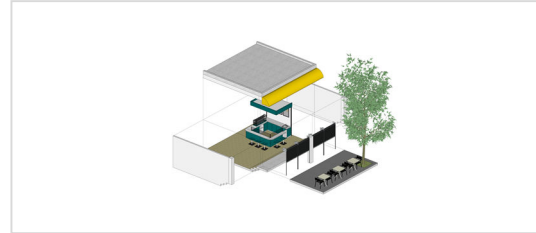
Exploded axonometric drawing of Pasar Tunjungan
